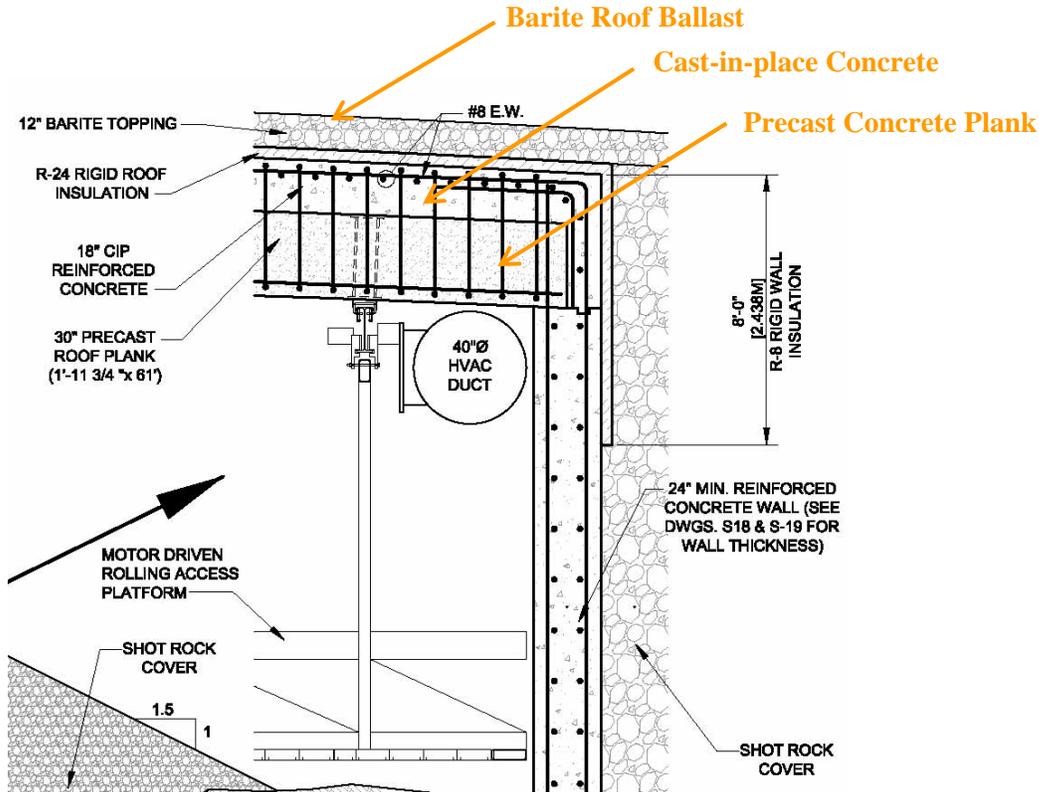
Detail at Detector Enclosure Wall/Roof Interface showing roof construction
